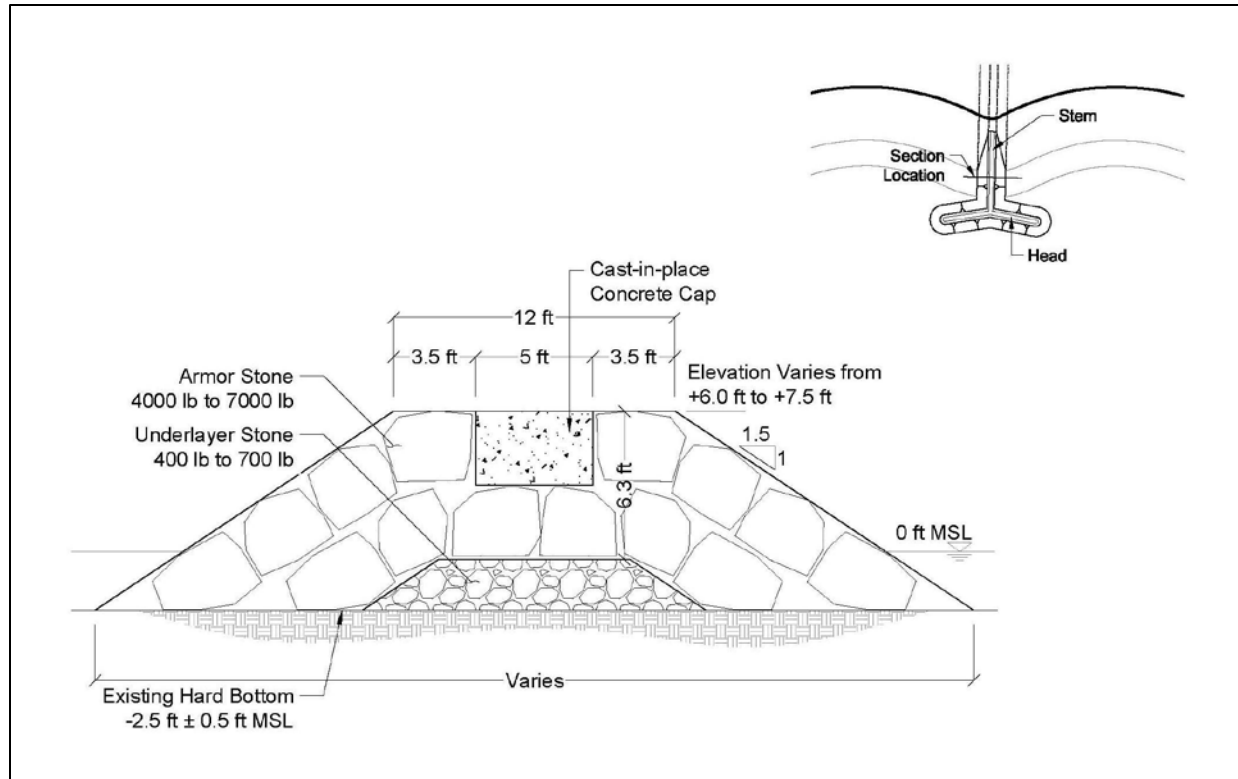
Section view of typical groin stems – Halekūlani beach sector
